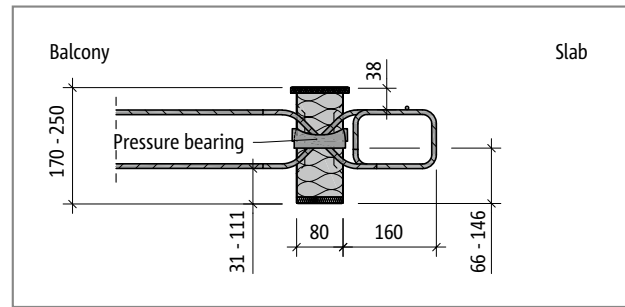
Schöck Isokorb® T type Q-E-W-VV4: Product section
